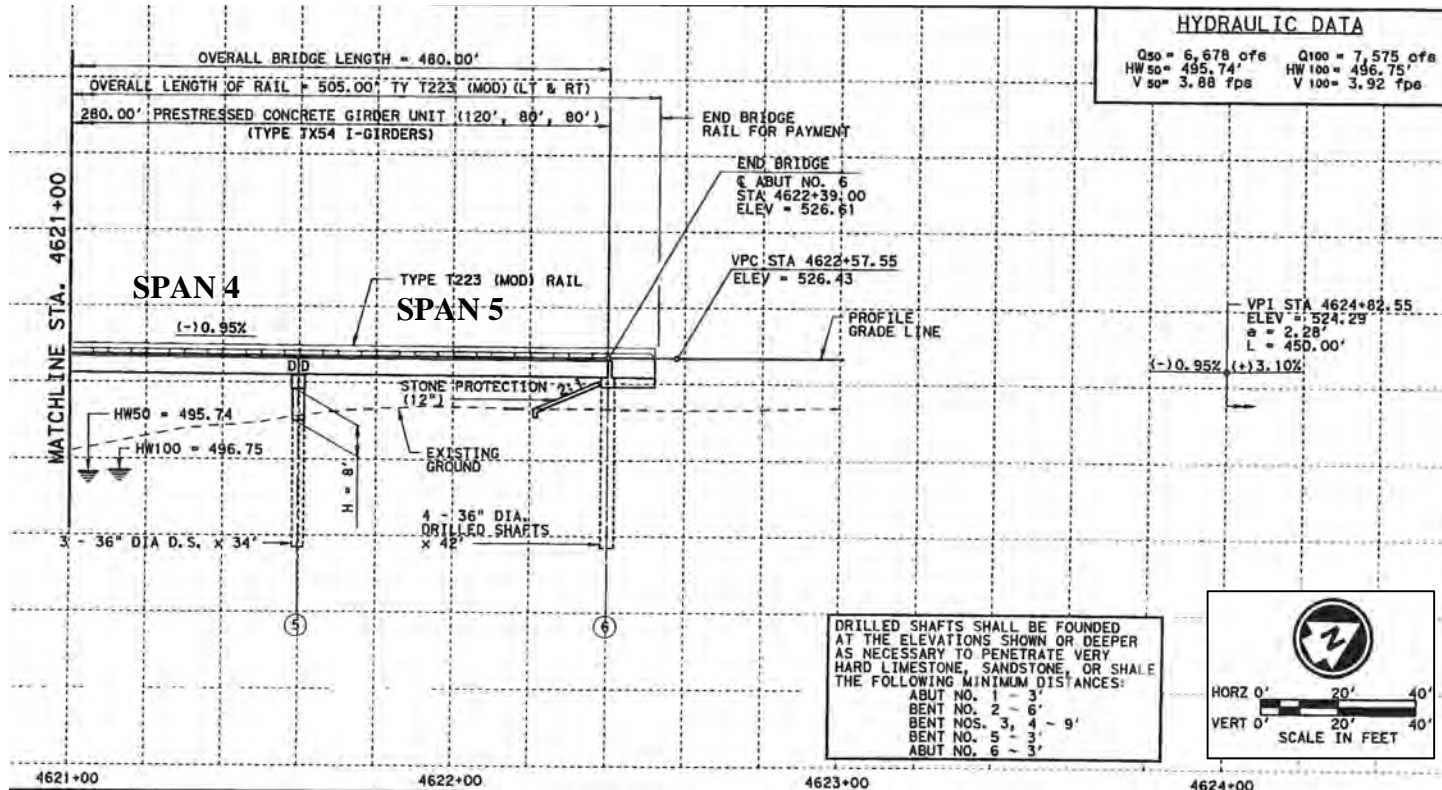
Section view of Lampasas River Bridge (Spans 4 to 5)
